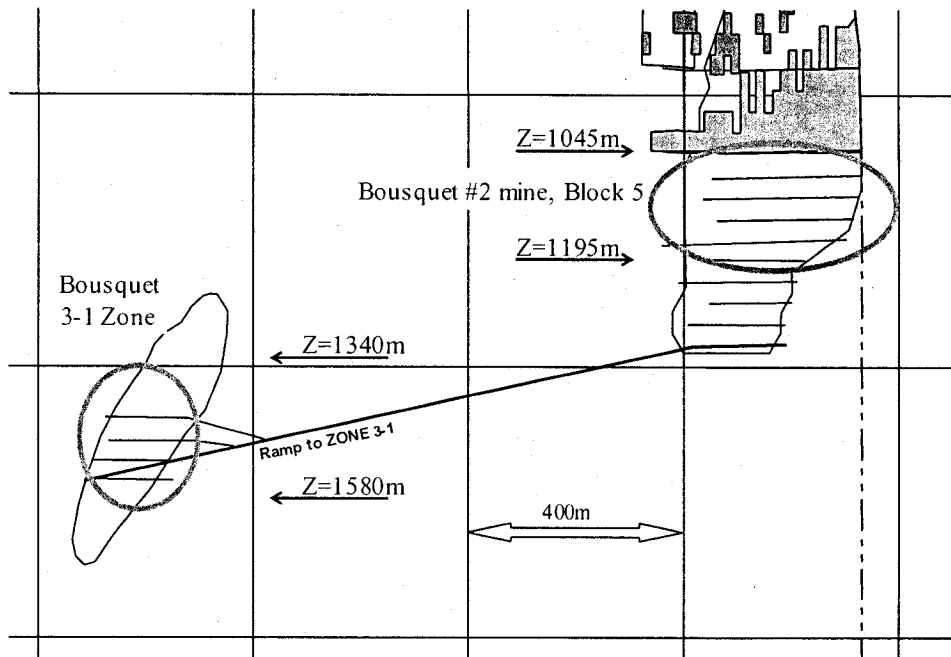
Detail showing locations of Block 5 and Zone 3-1, longitudinal view
